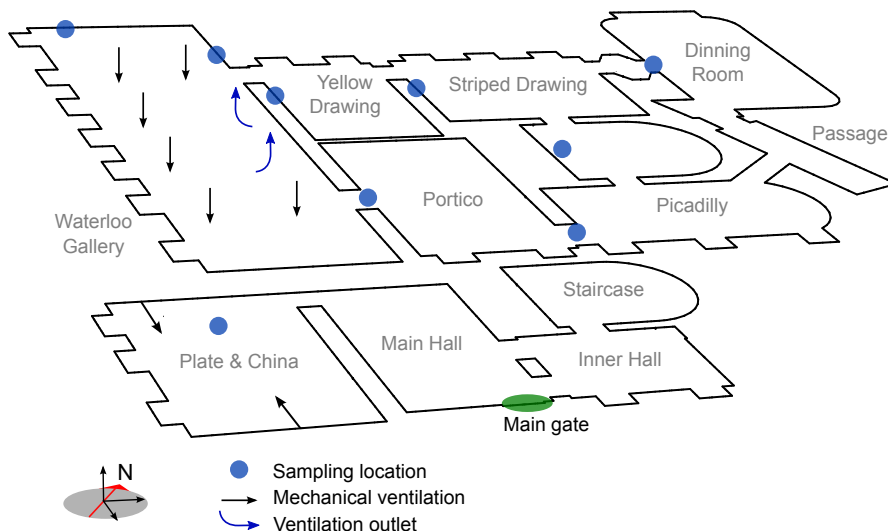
Floor plan of Apsley House with monitoring locations.
